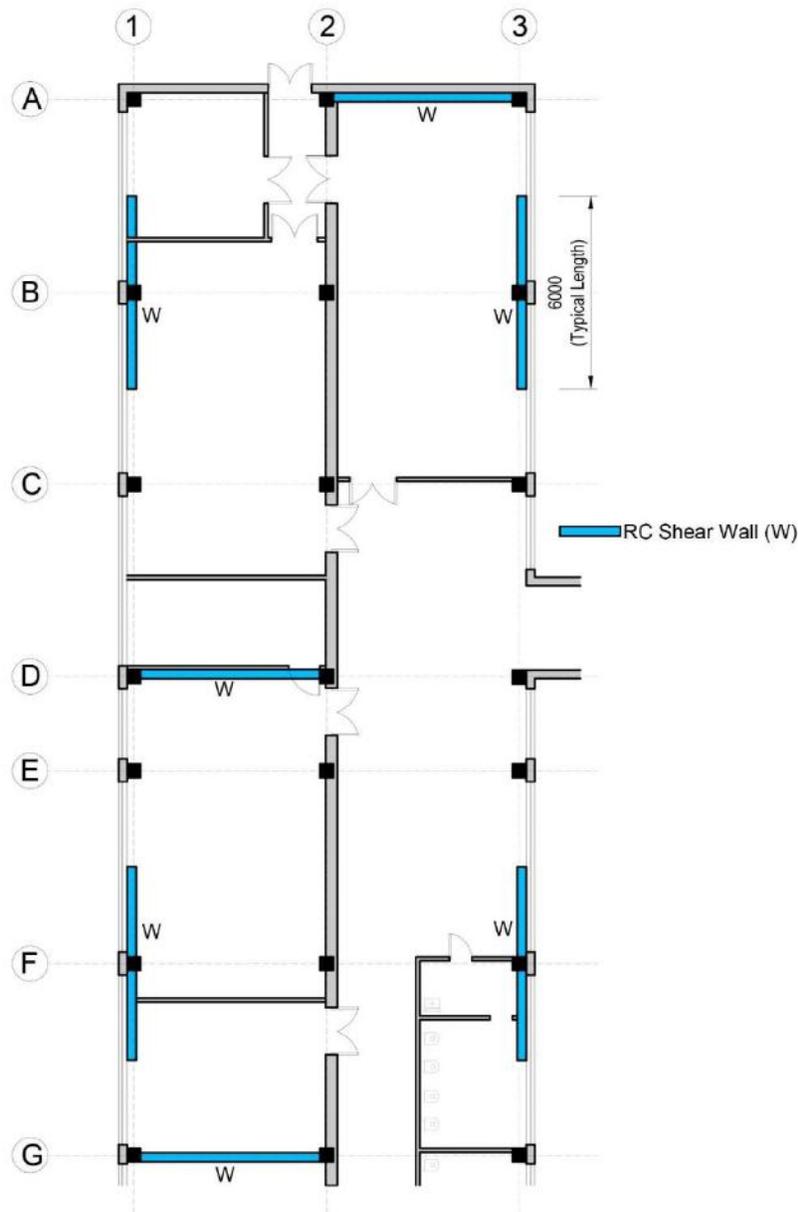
Floor plan of the retrofitted building with RC shear walls (RS3).
